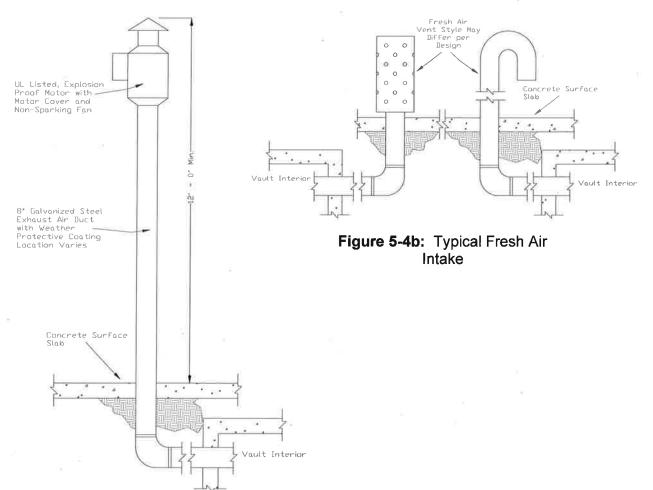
Sectional Views of Typical Vaulted AST (Ventilation)
